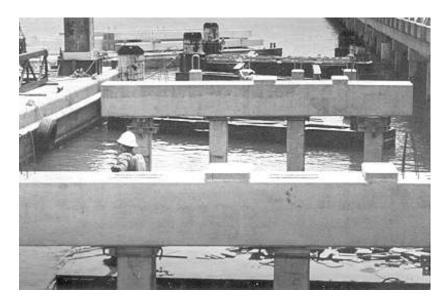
Precast Bent Caps on Red Fish Bay Project
